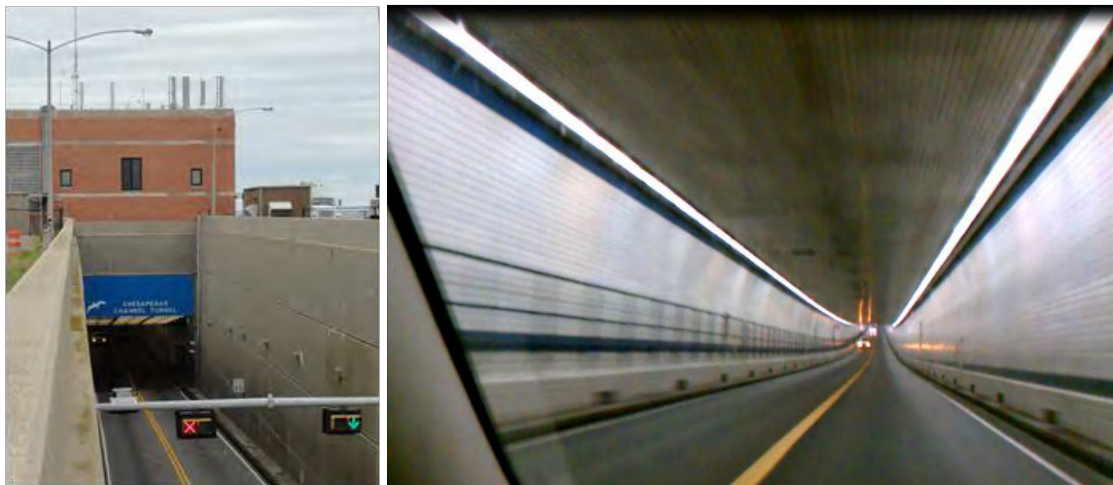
Chesapeake Channel Tunnel: entrance (left) and interior view (right).
